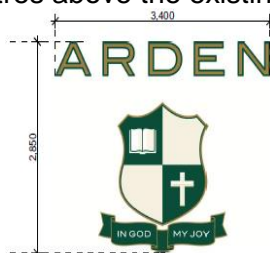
Building Identification signage along the Essex Street building façade. Source: Stanton Dahl Architects
